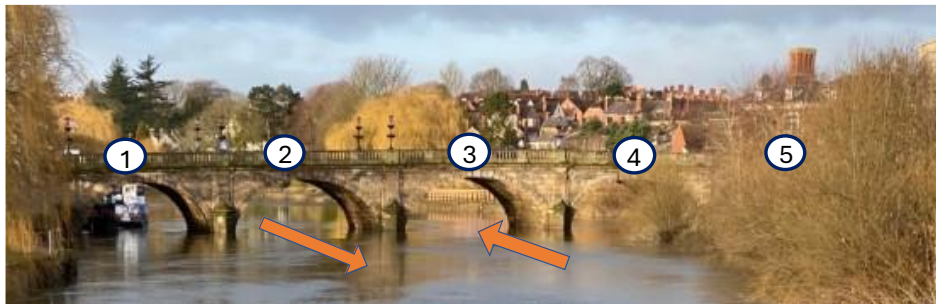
Welsh Bridge Viewed Looking Downstream
